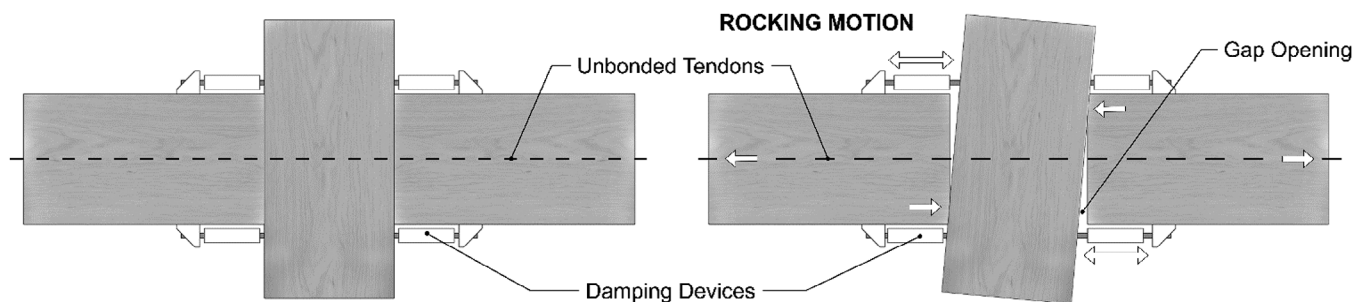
Hybrid post-tensioned dissipative connection for timber elements.
